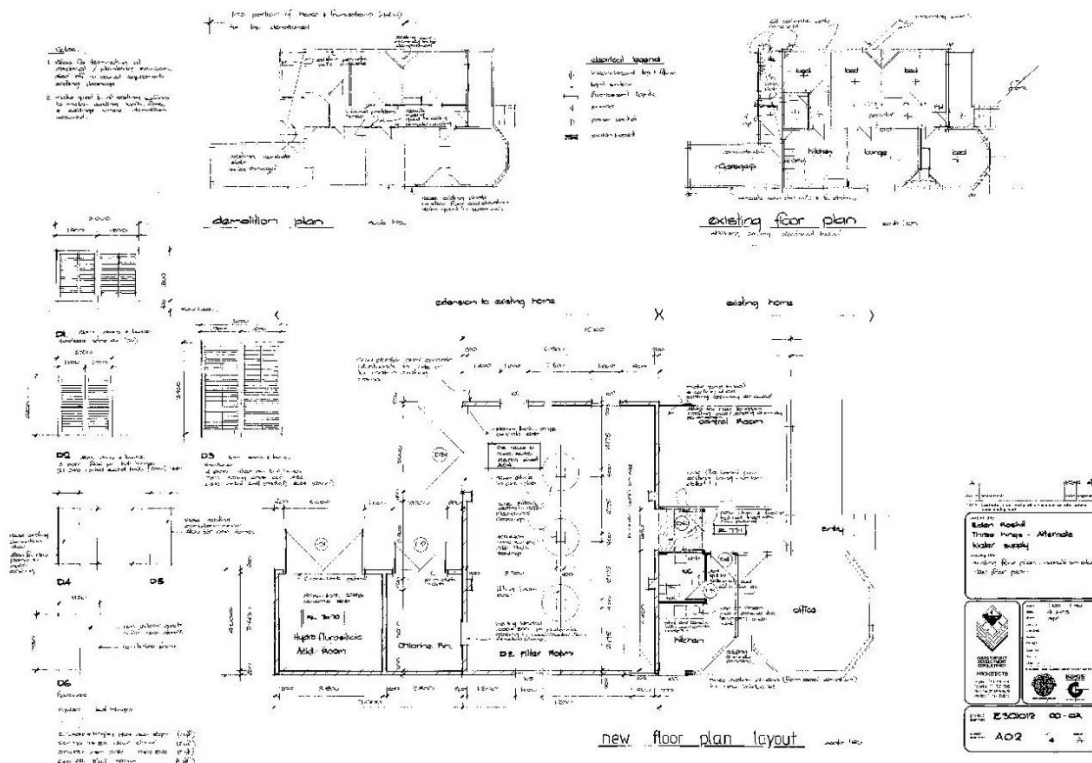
Floor plan of the original office building with new floor plan following development of the water supply building
